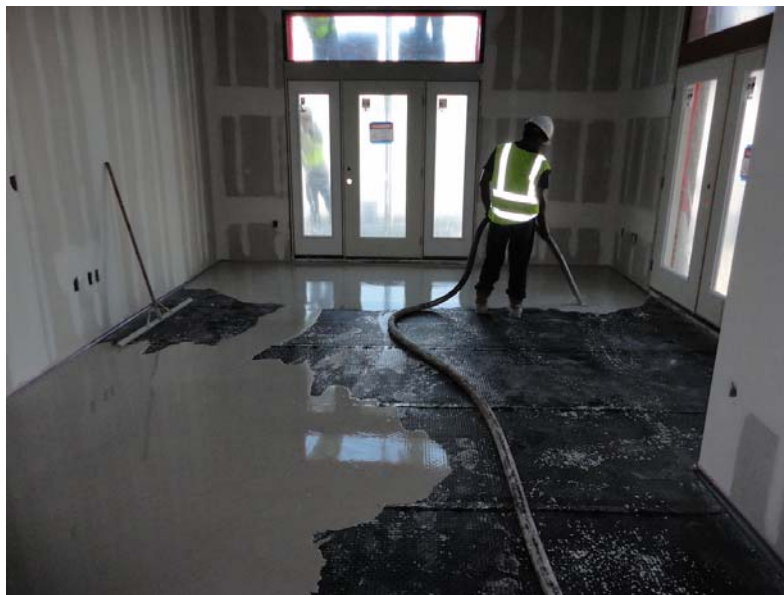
Floor assembly air sealing - Floor assemblies that are sound proofed and fire proofed with liquid gypsum subflooring result in airtight wall assemblies at floor to wall connections
